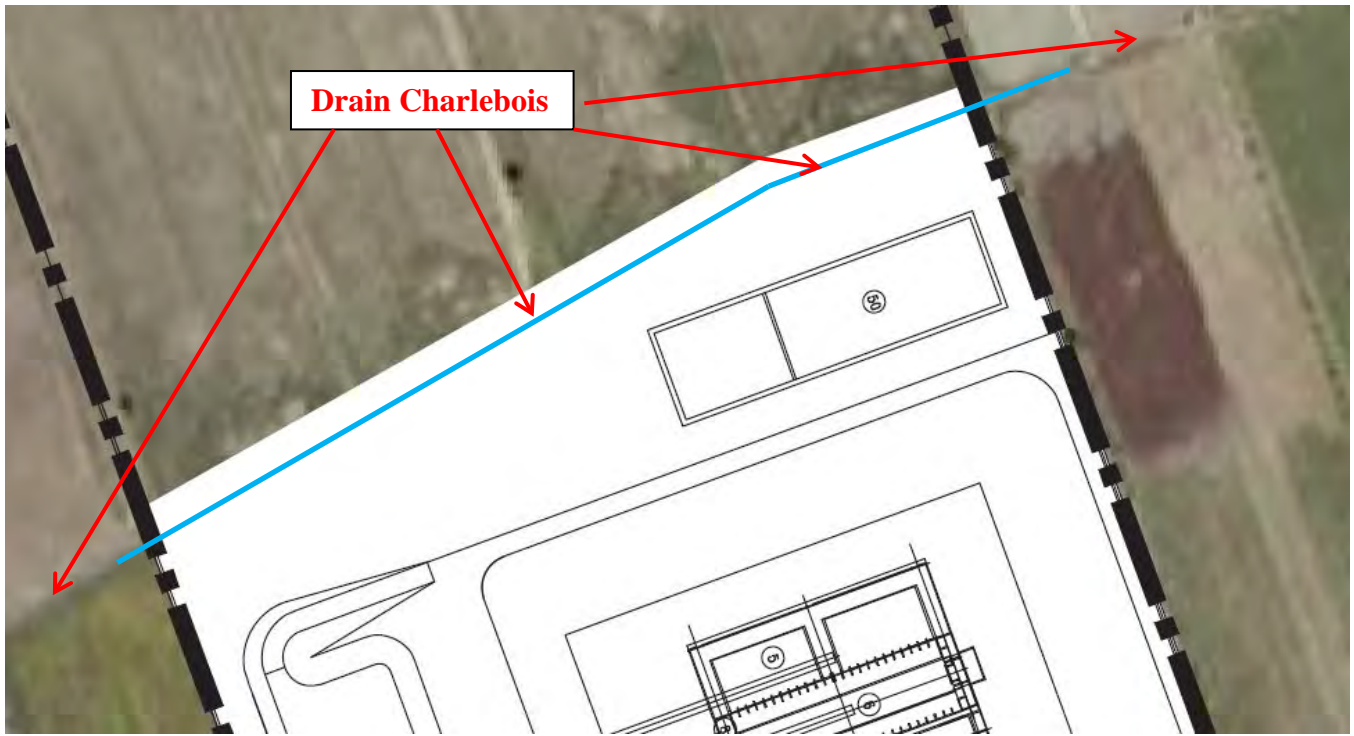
Enlarged section of the Revised Site Plan showing the Storm water basin (structure No. 50) and its proximity to the drain Charlebois (drawn in blue where it will be under the site). The arrows in red point to the drain Charlebois. Screen capture of page 80.⁴³ Note the proximity to the drain Charlebois.
